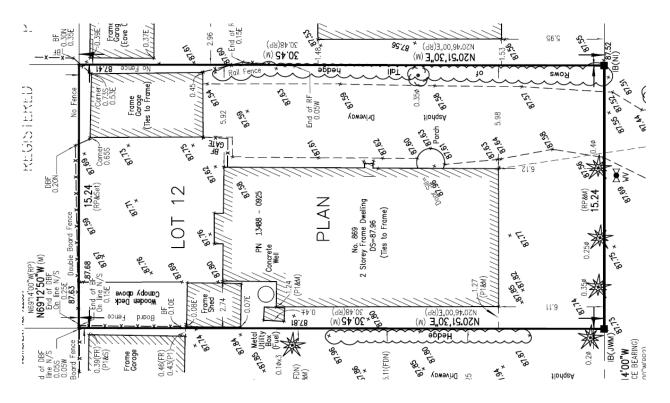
Detail of survey of lot 12, block H, Plan B88, 869 Sangster Avenue. (Image from owners.)
